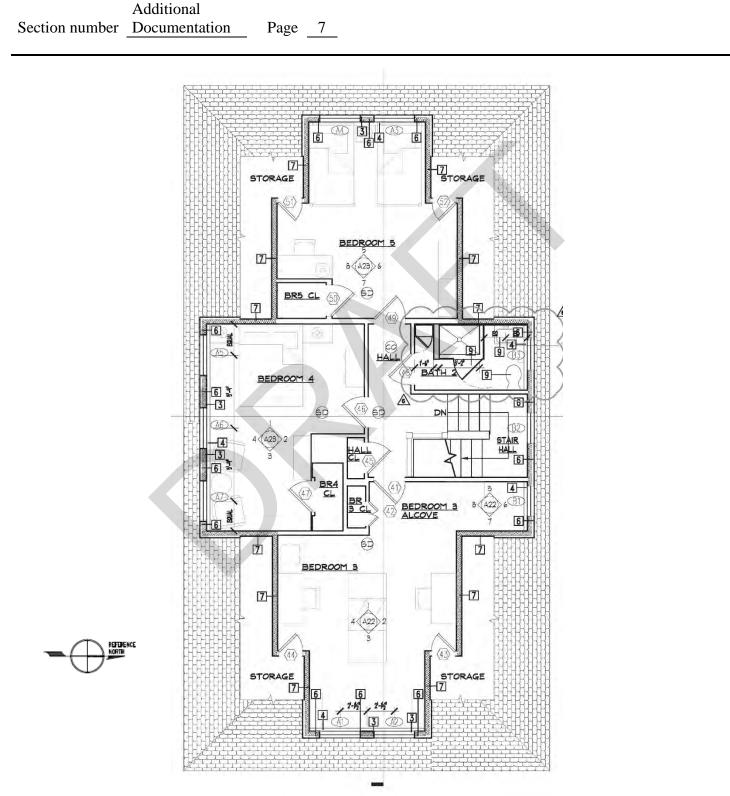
Third Floor Plan (Detail, Drawing A5, Gensler 2011)
